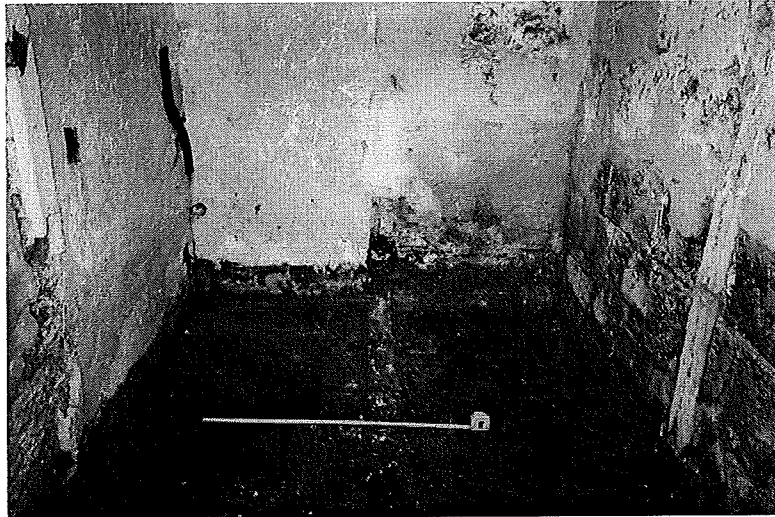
concrete pad and brick (contexts 10 & 11) dividing wall at western end of trench
